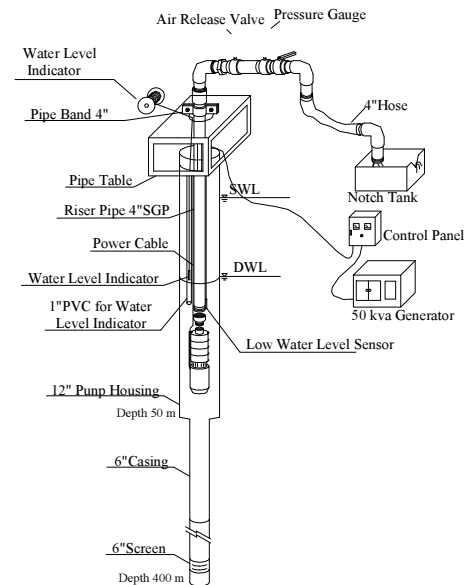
Conceptual Drawing of Pumping Test Equipment Installation (for Production Wells)
